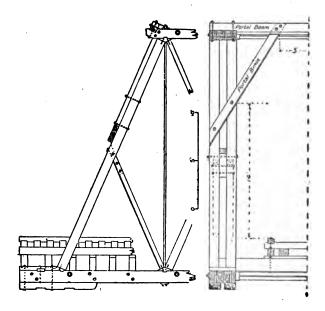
Portal Bracing for Howe Truss Through Spans of 90 ft, and over.
